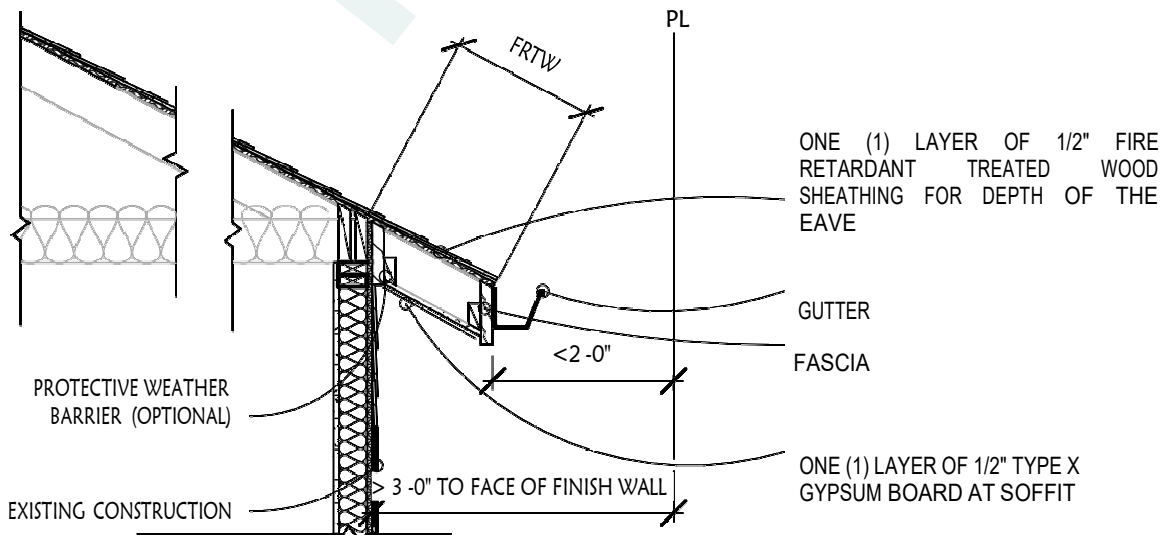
ROOF EAVES OR OTHER PROJECTIONS - EXISTING SHEATHING TO BE REPLACED
